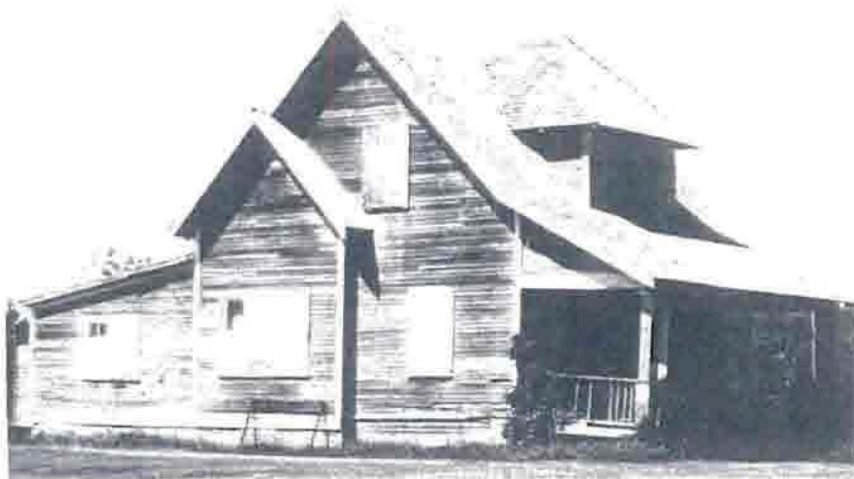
S. Sigurgeirsson's Frame House before Stabilization
